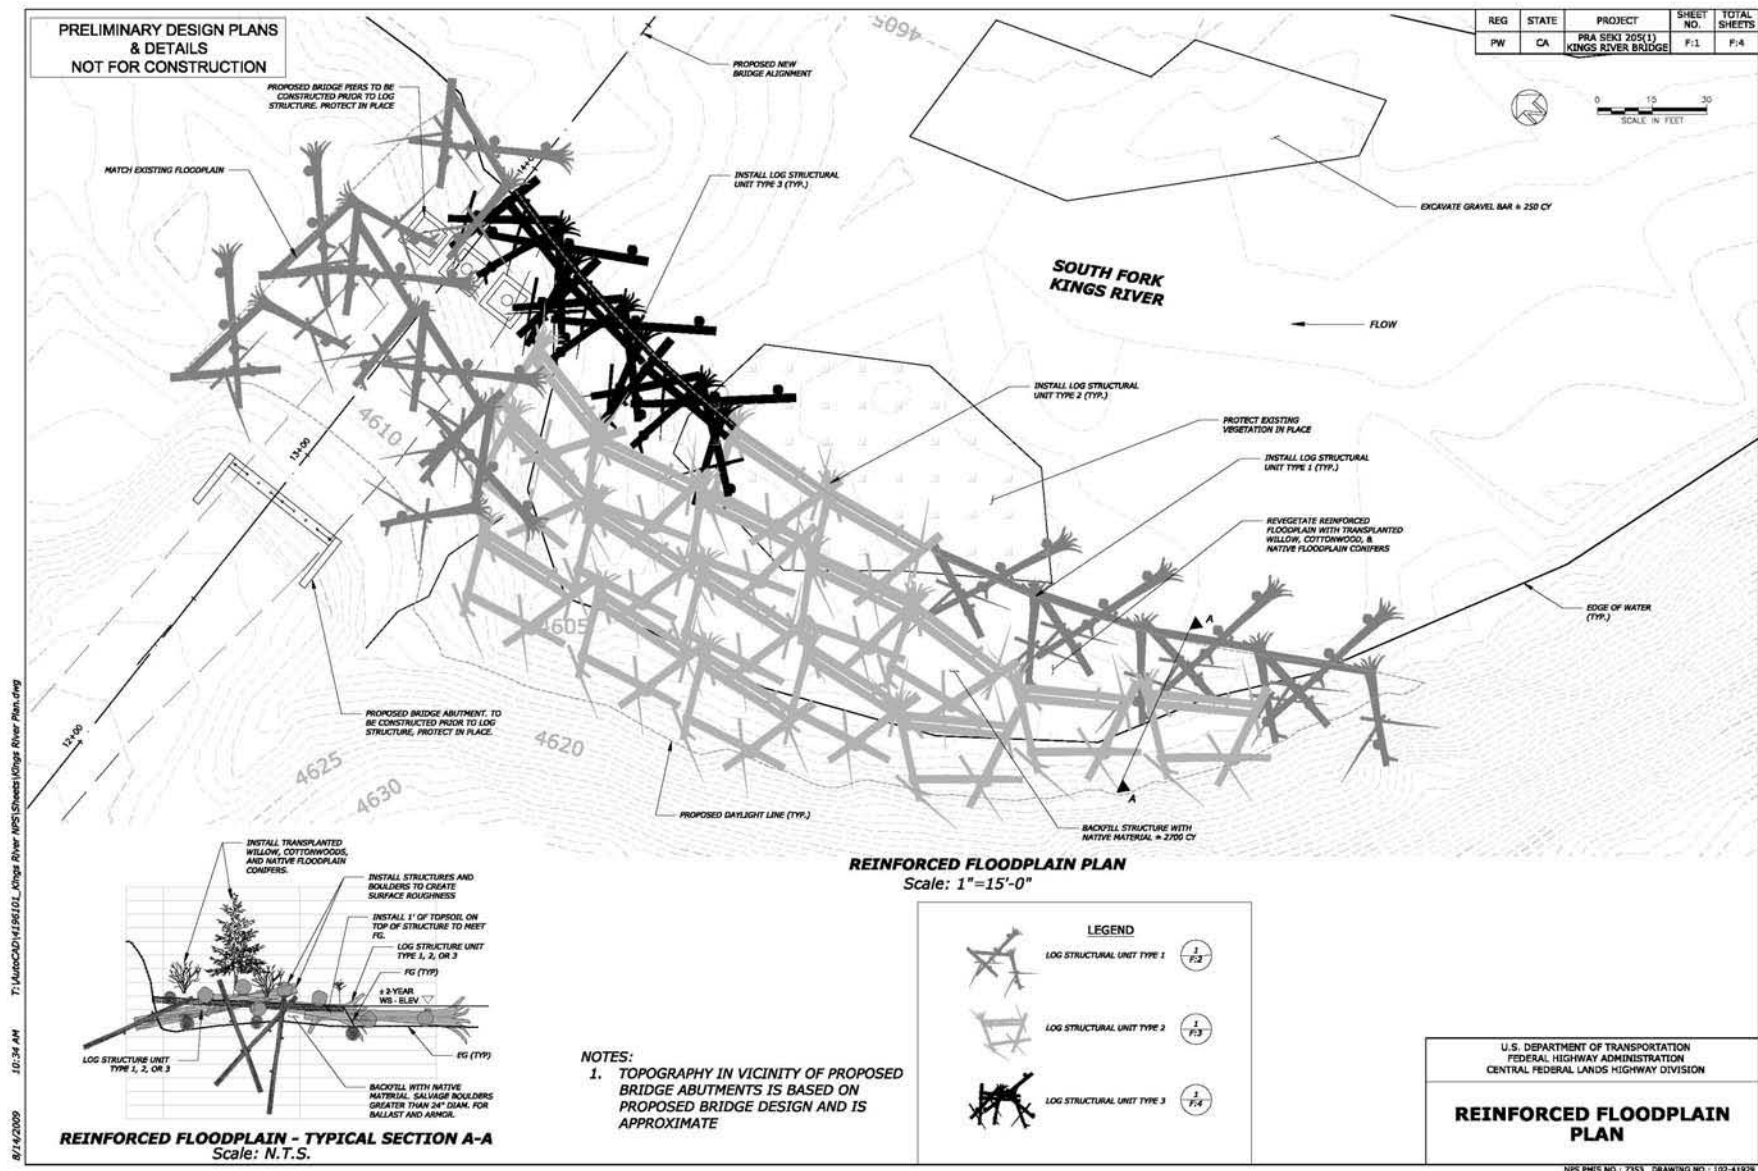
Schematic Design Plans for a reinforced floodplain (ENTRIX 2009).
